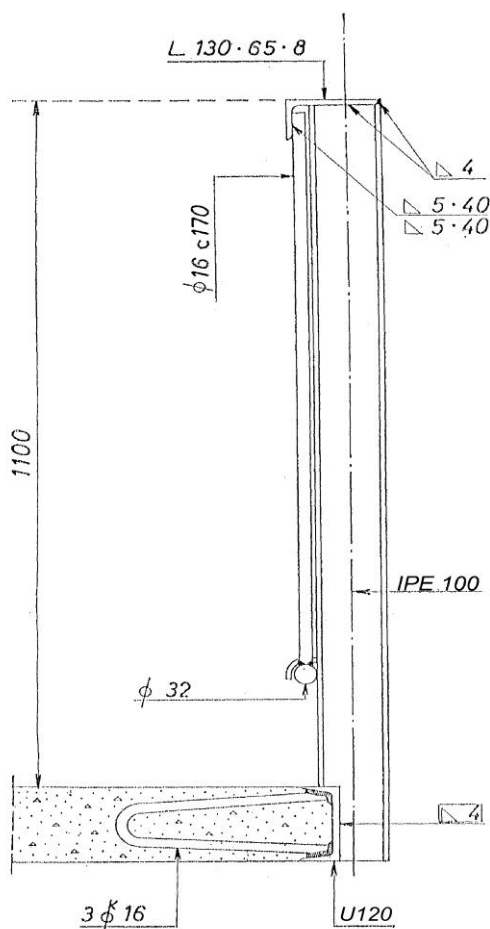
Cross-section of the railings of the bridge in Steinkjer. Figs 6 to 6c.
